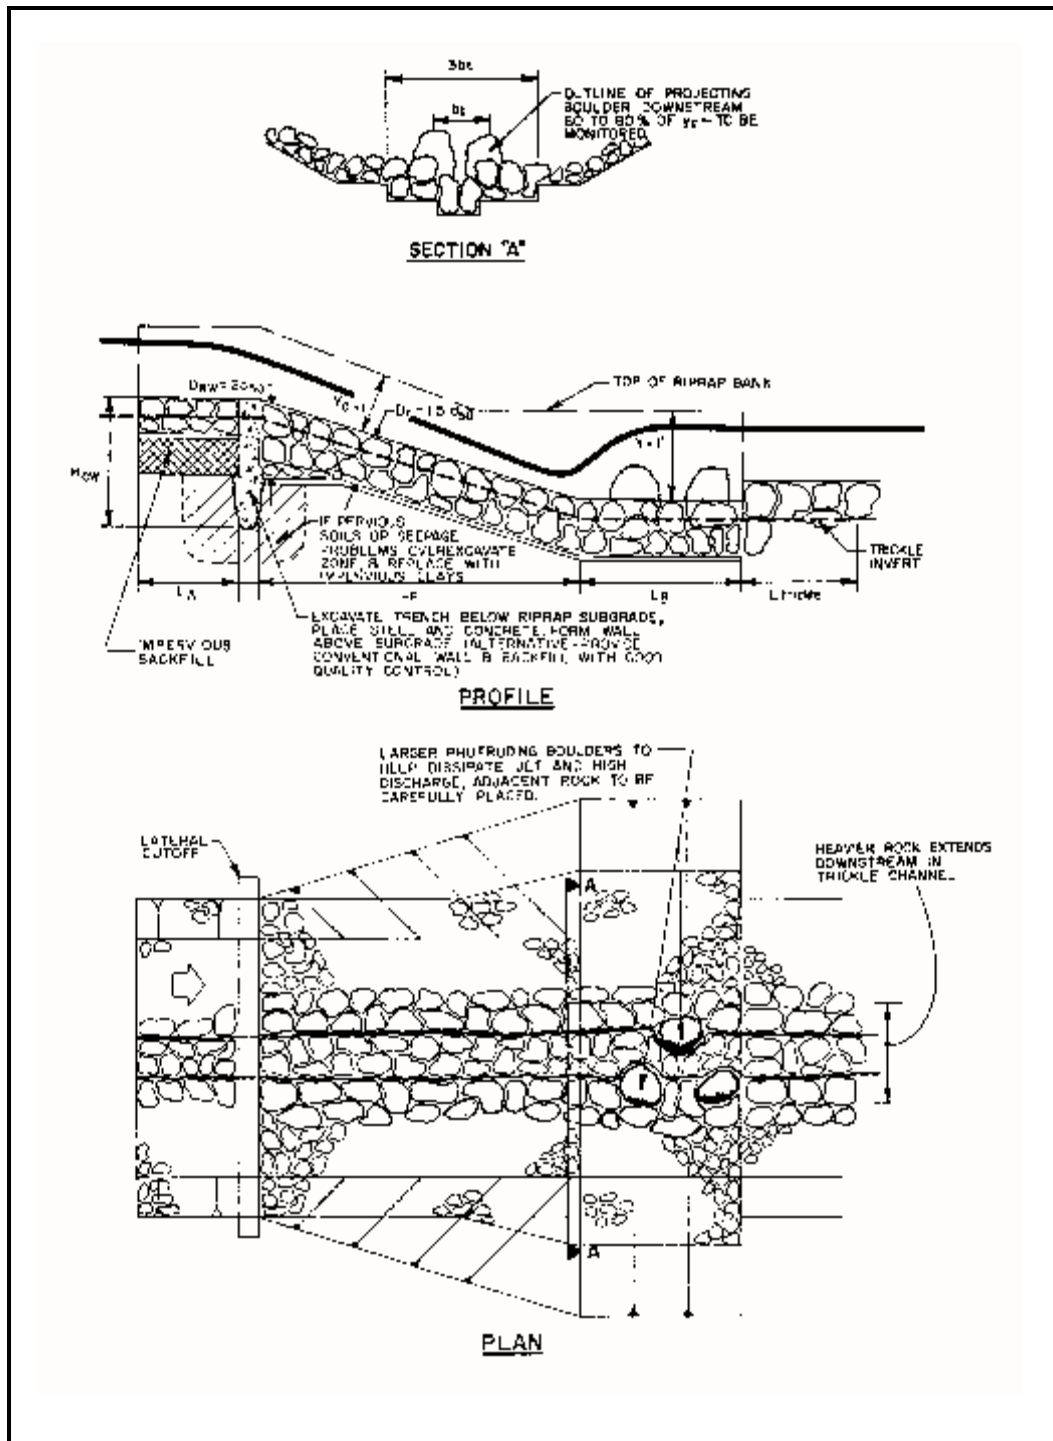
As Built Riprap Grade Control Structure with Sheet Pile Cutoff Wall
